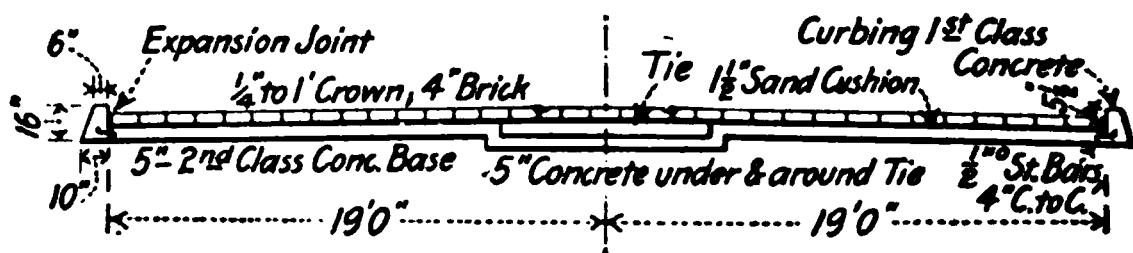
A. — Village Street, Brick Pavement. Tracks in center, "T" Rail Special Grooved Brick
